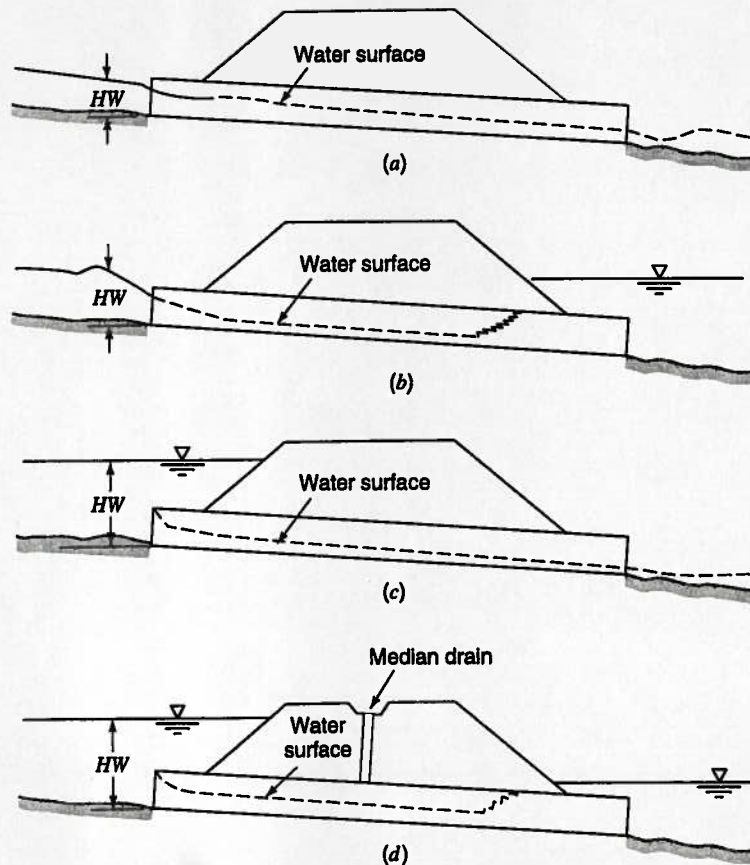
Types of inlet control. (a) Outlet submerged; (b) Outlet submerged, inlet unsubmerged; (c) Inlet submerged; (d) Outlet submerged (from Normann et al. (1985)).
